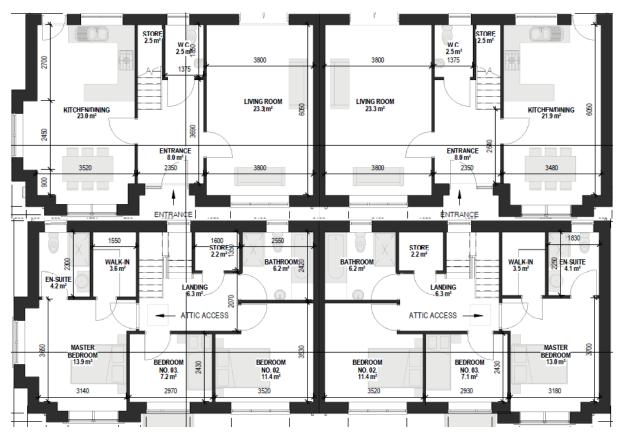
Typical ground floor plan of House Types 4.1-4.4 (top) and typical first floor plan of House Types 4.1-4.4 (bottom).
